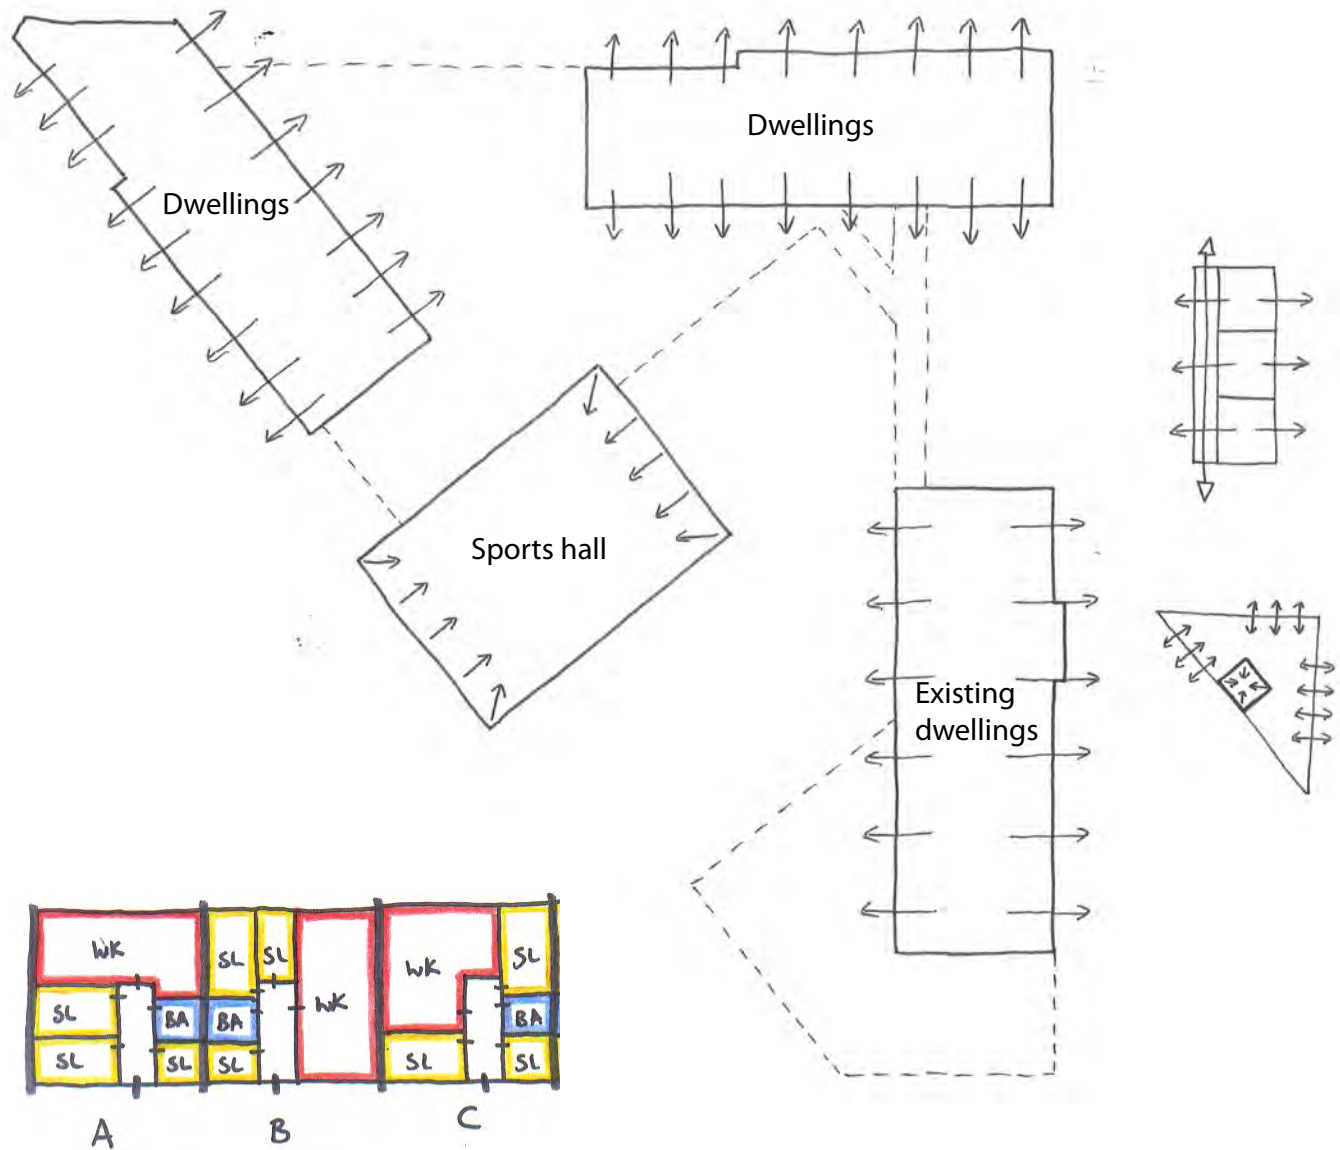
| Principle of floor plan: corridor with two side orientation | author, 2012
